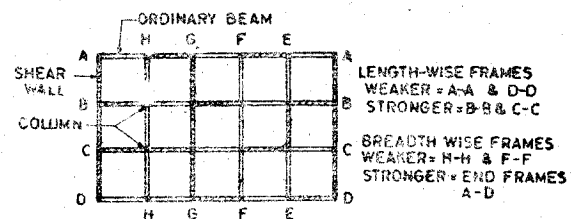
A Typical Floor Plan Showing Weaker & Stronger Frames in Both Directions.
